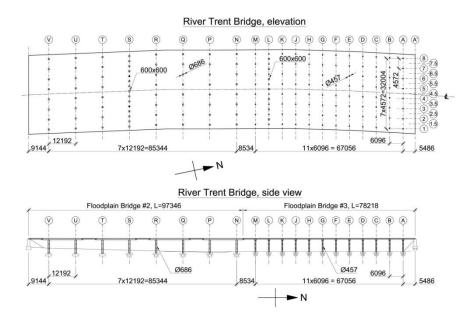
Sketch of the River Trent Bridge: elevation (top) and side view (bottom)
